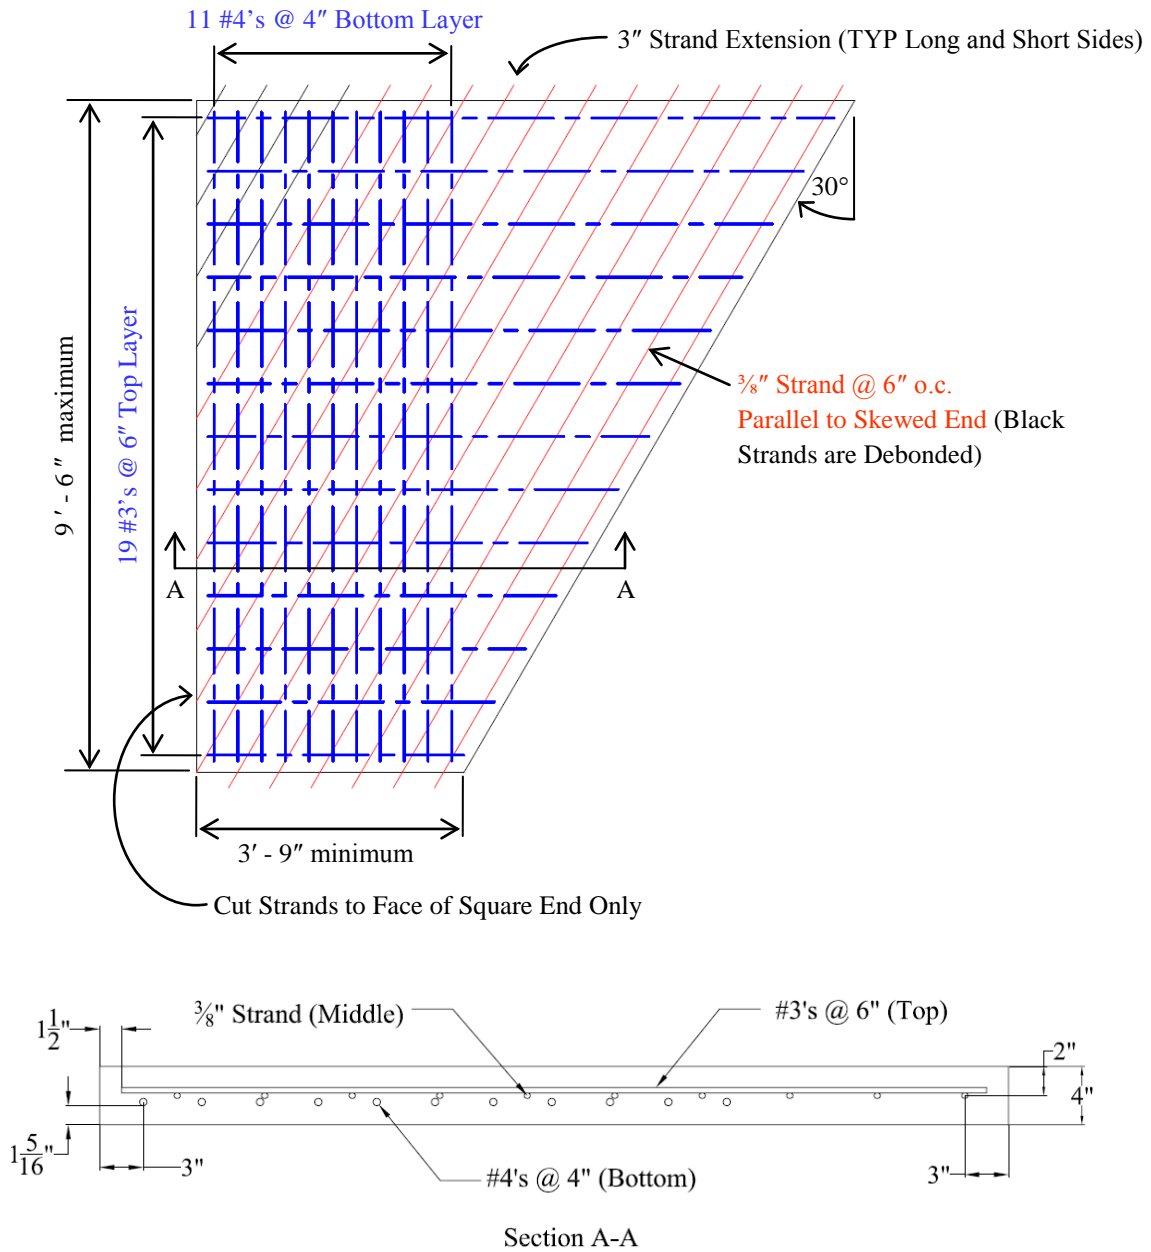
Recommended 30° Skew Panel Ordinary Reinforcing Layout and Detail (modified from TxDOT Report No. FHWA/TX-09/0-5367-1: Recommendations for the Use of Precast Deck Panels at Expansion Joints, 2008)
